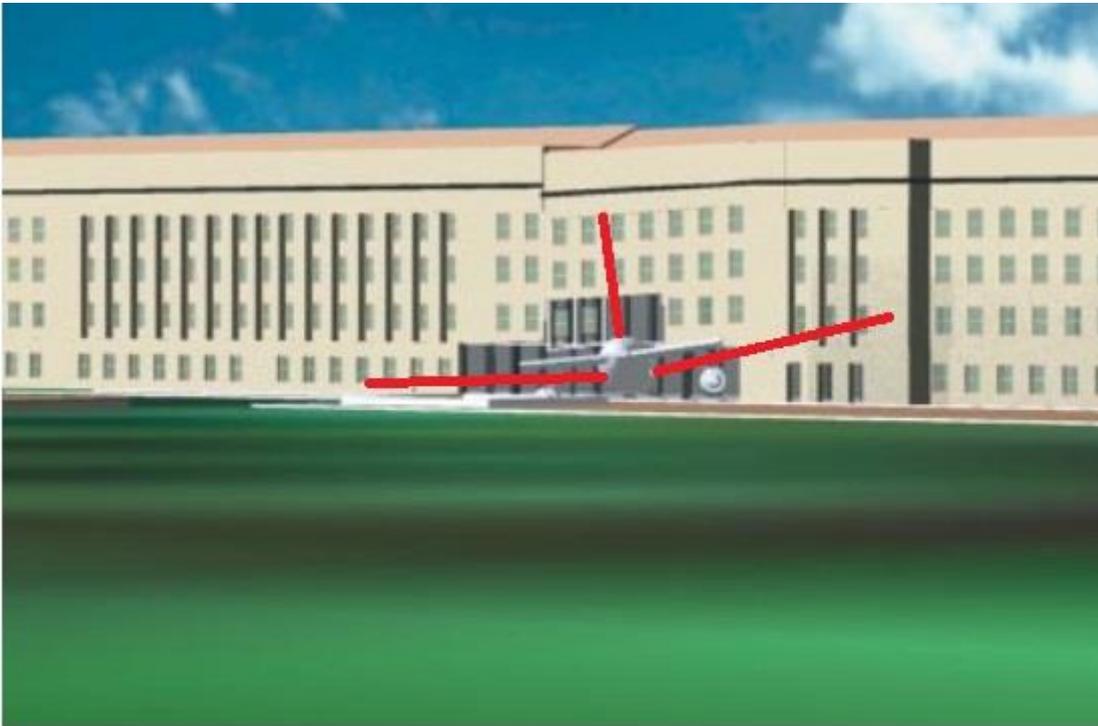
Aircraft aligned with damage on west facade
